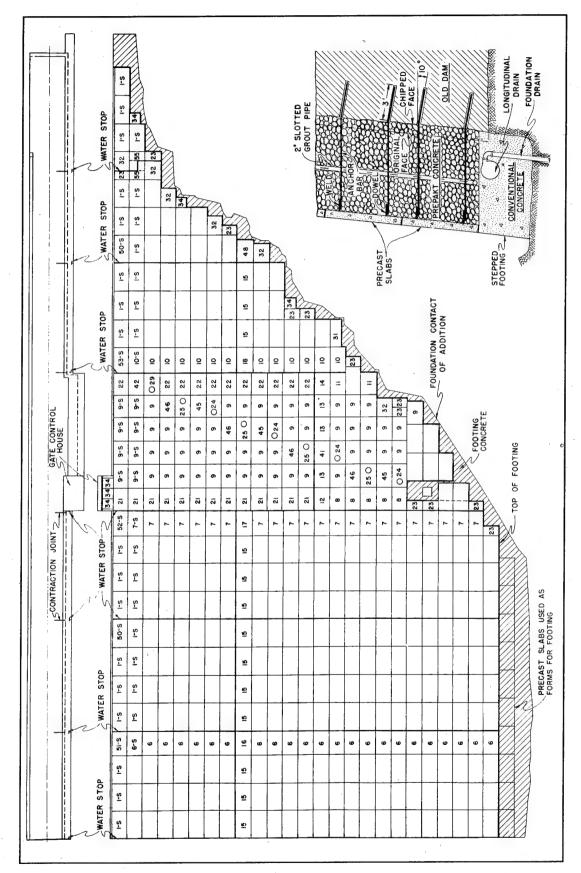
Footing and slab layout, south half of Barker Dam (from Davis, Jansen, and Neelands 1948b)
